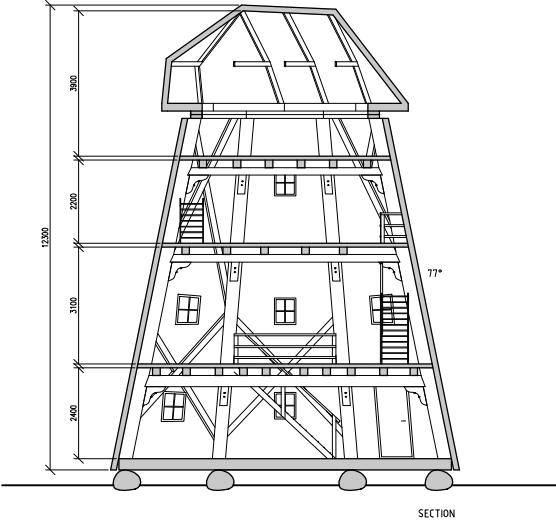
Existing section of the Pilebo windmill, scale 1:200.
